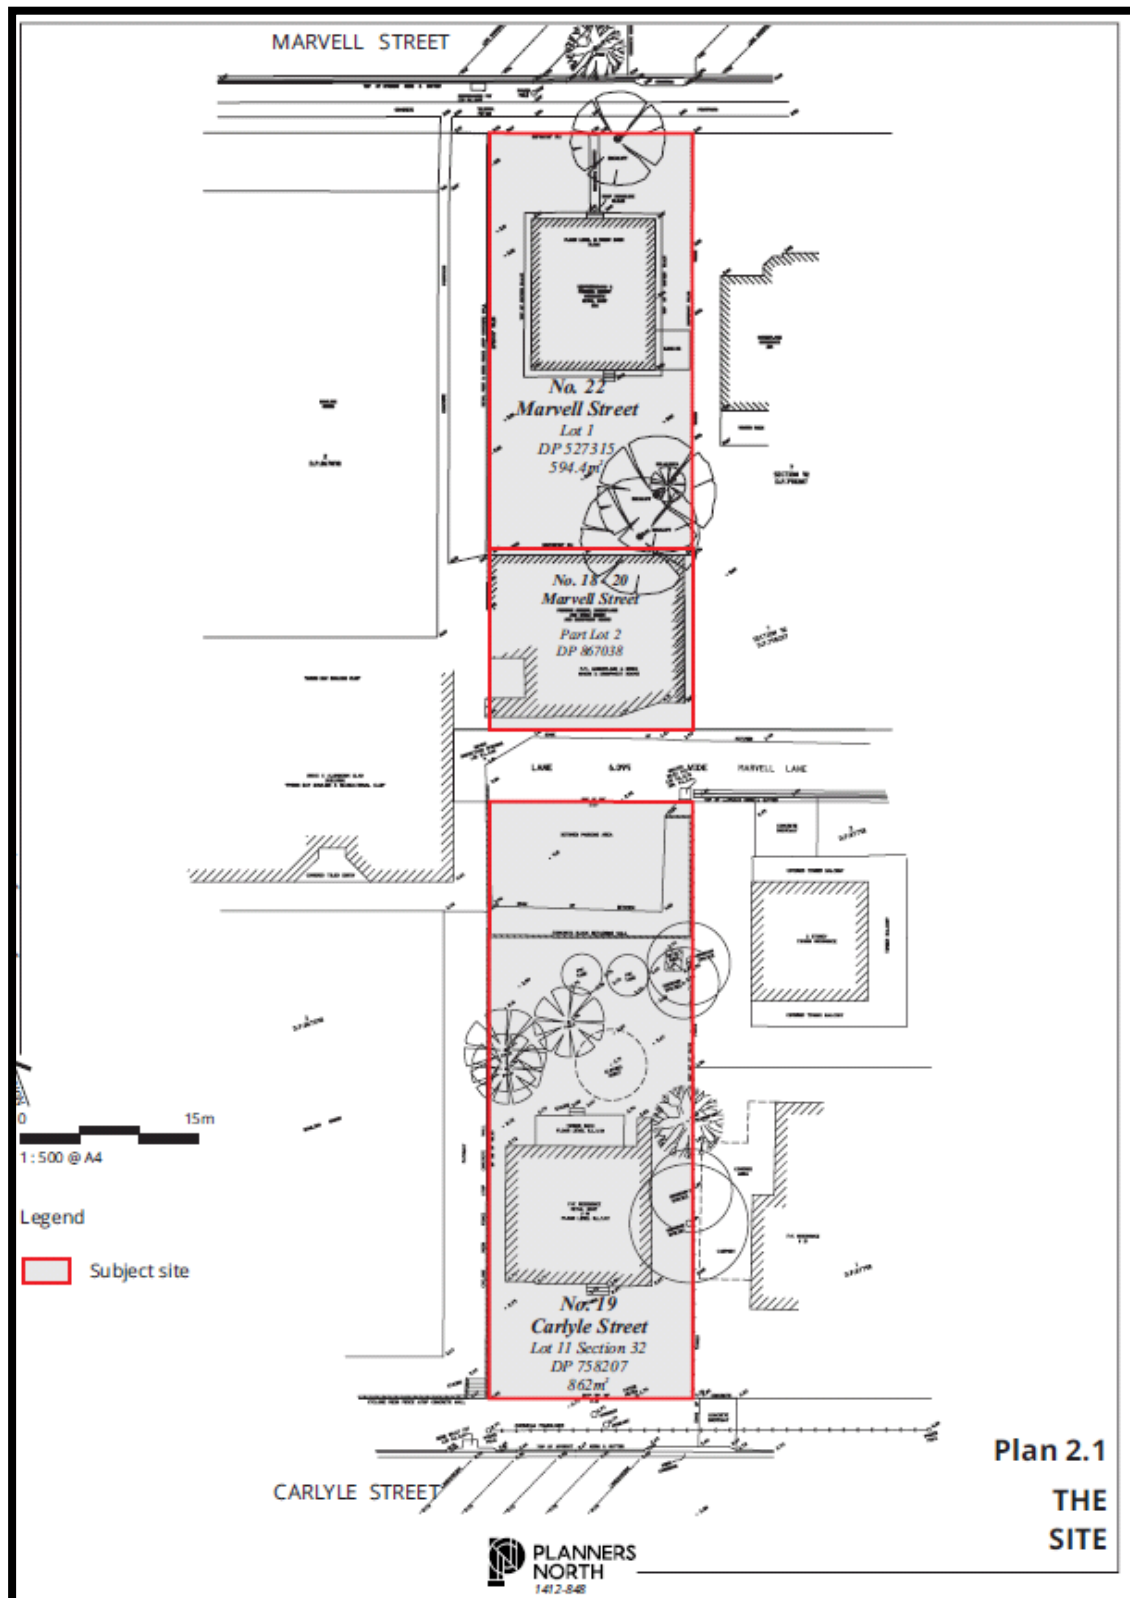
Site plan submitted by applicant showing existing dwelling-houses and structures
